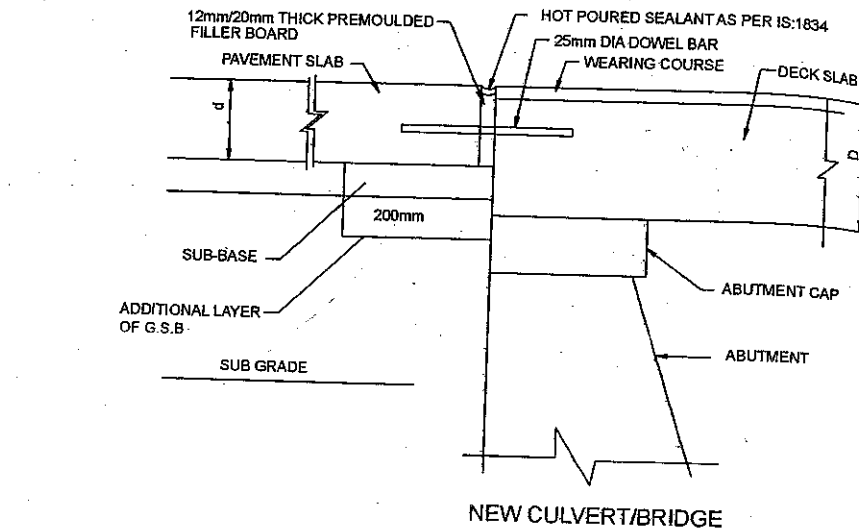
Expansion Joints at Culvert/Bridge Approaches
